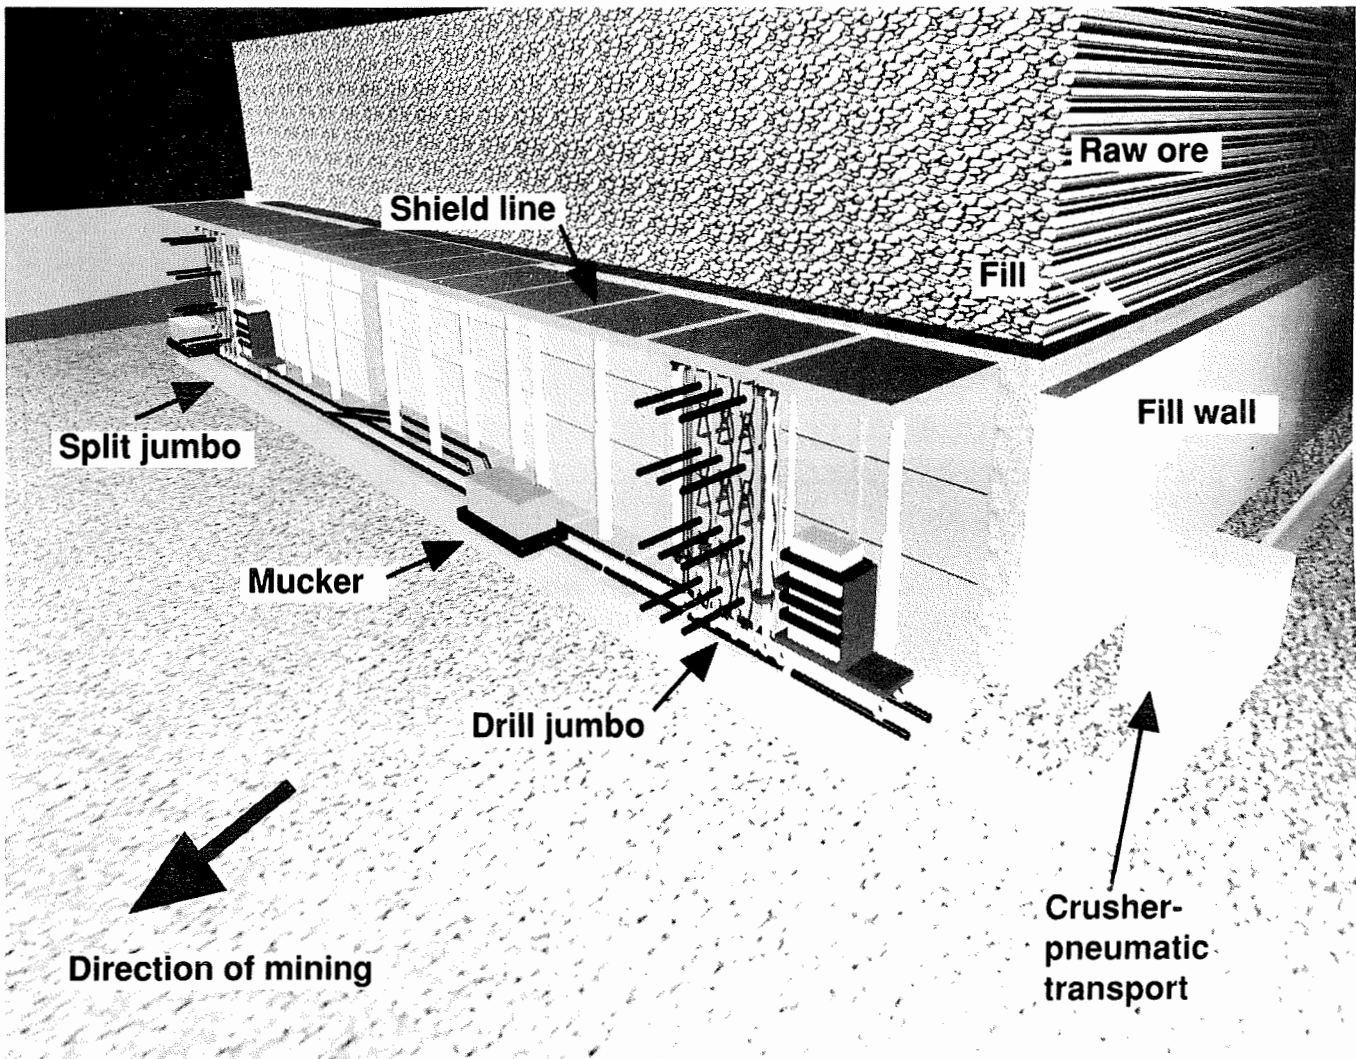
Conceptual design of drill-split longwall mining system. [Adapted from Lombardi (6)]
